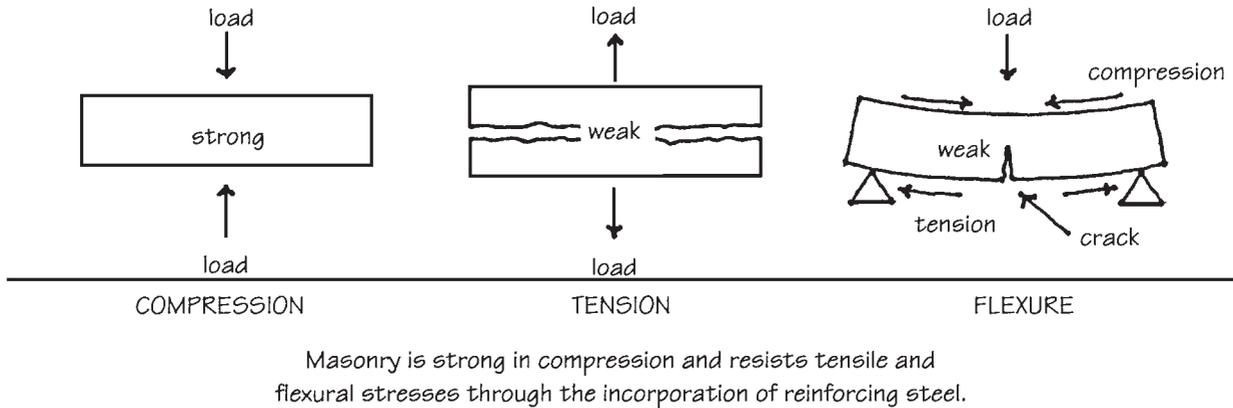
Compressive, tensile, and flexural strength of masonry.
